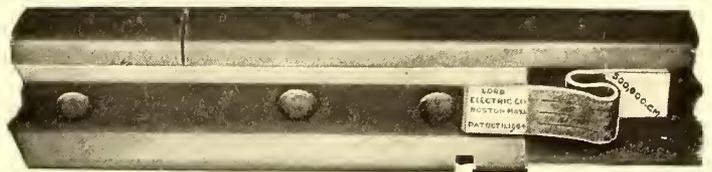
SHOWING APPLICATION OF SOLDERED BOND
